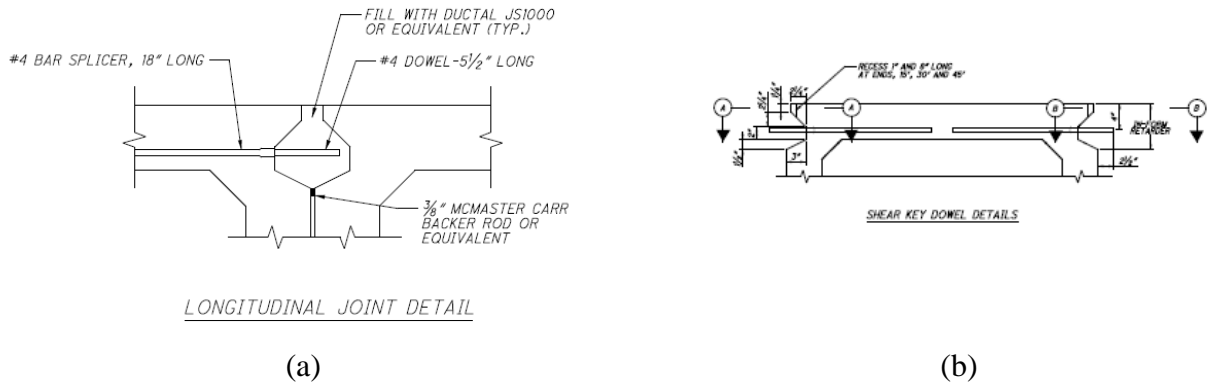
(a) Longitudinal joint detail and (b) shear key dowel detail [63]
